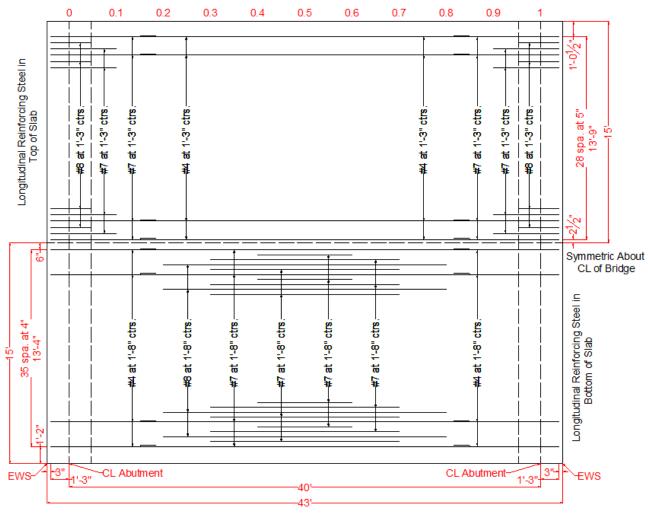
shows the reinforcement design for the 40-ft. haunched-slab section in plan view.
